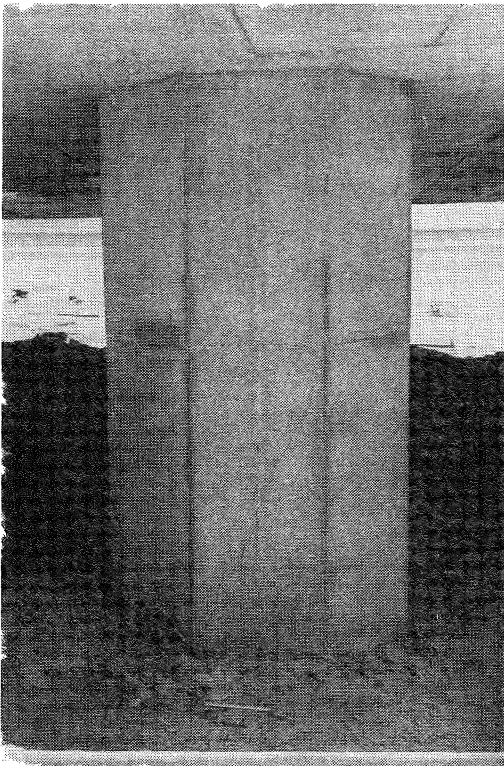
Shear cracking in Column 9, the shortest column (7 ft) supporting the South Connector Overcrossing. Other remaining columns were undamaged.
